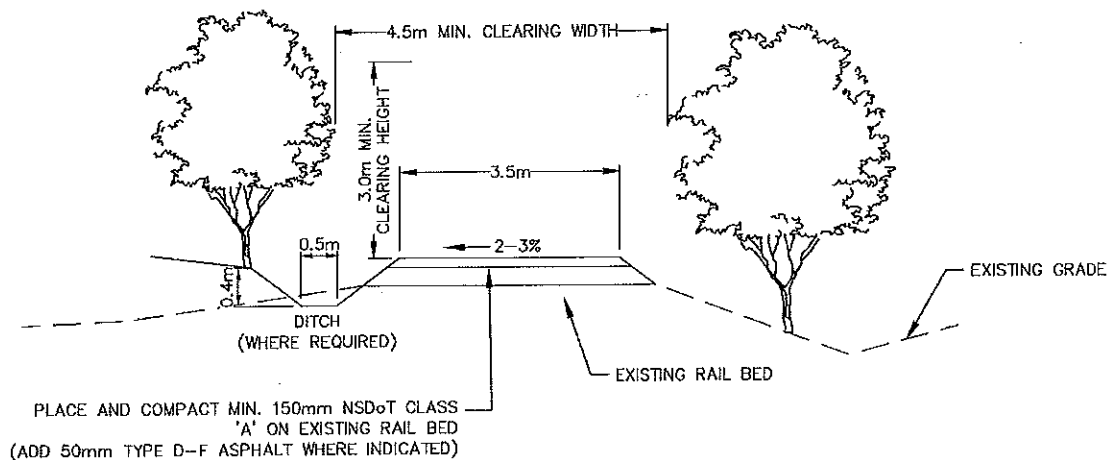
Typical Trail Cross Section at Existing Rail Bed
